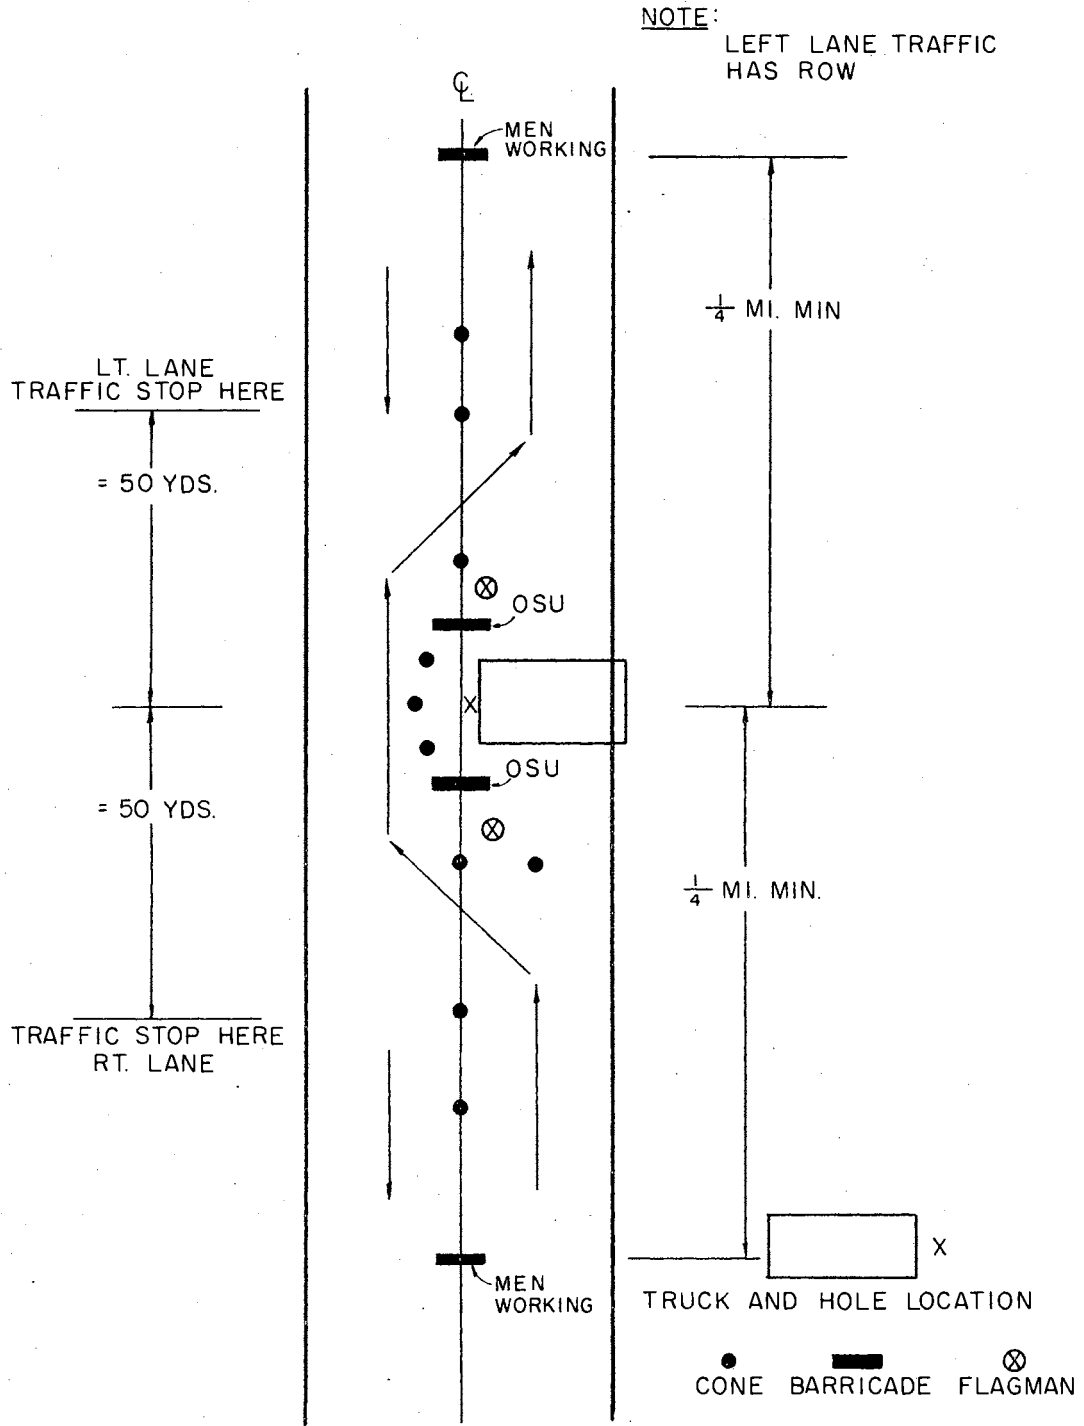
Traffic Routing When Drilling in Center of Pavement
